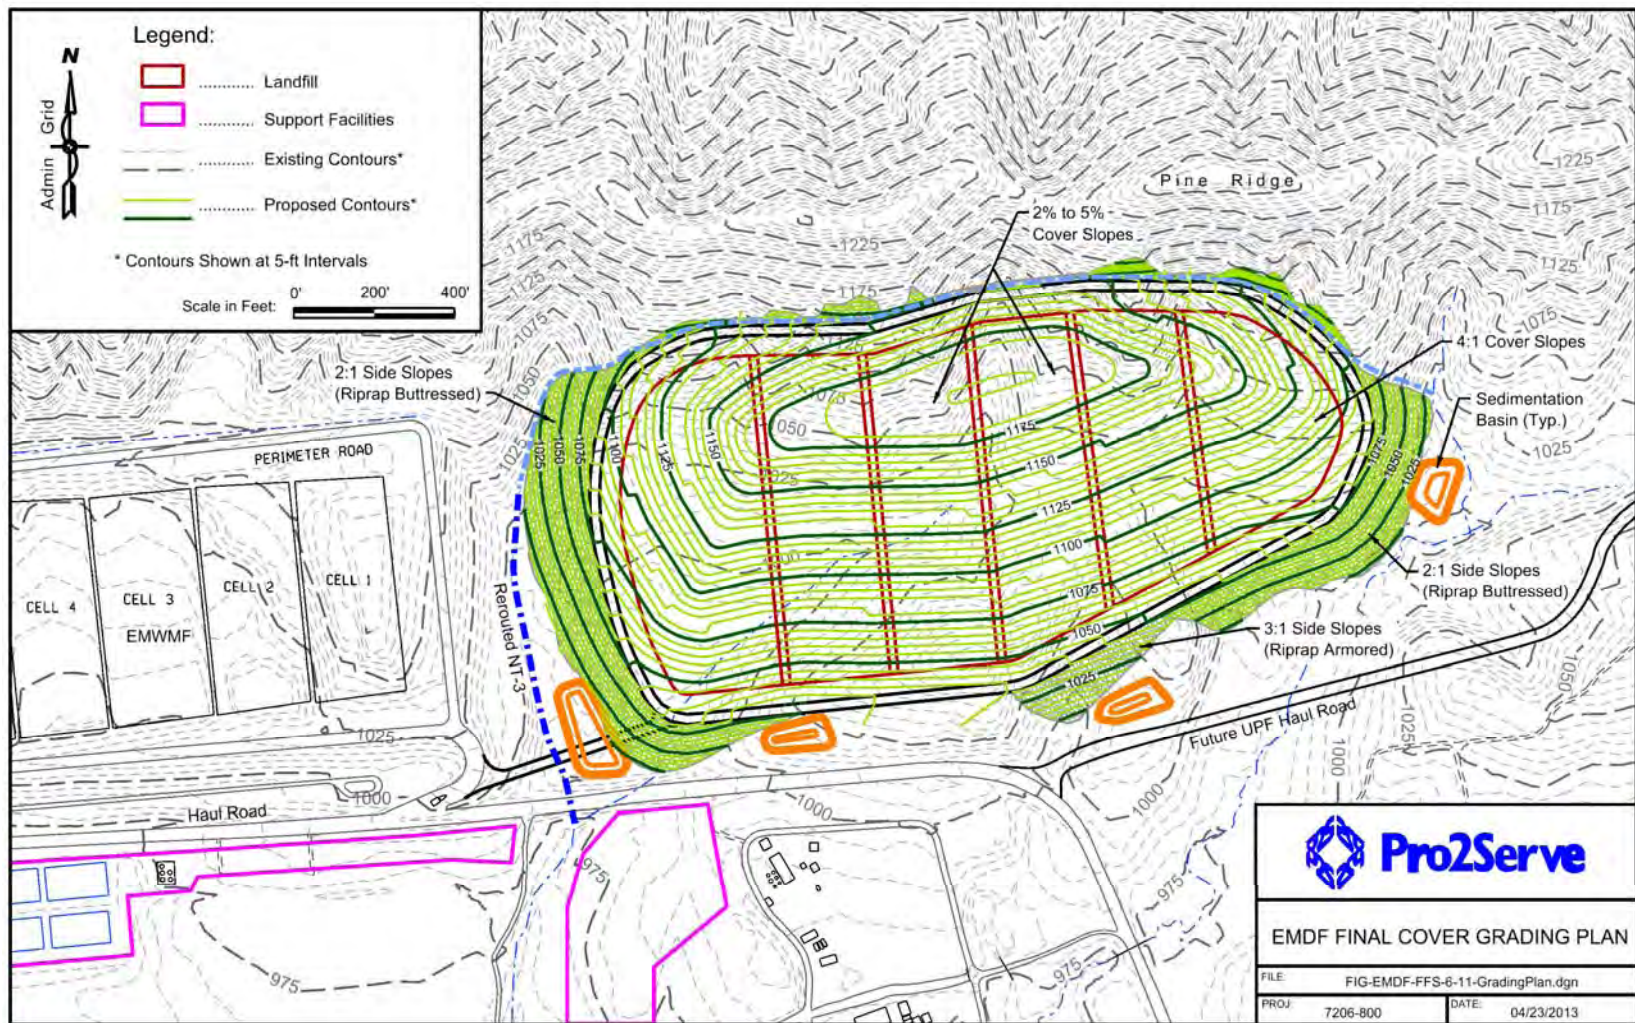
EMDF Final Cover and Grading Plan for EBCV Site
